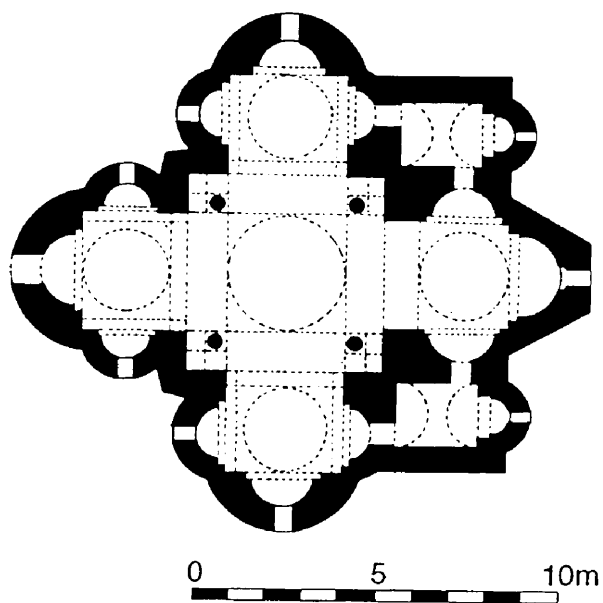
Persisterai, St Andrew, plan (Krautheimer).
